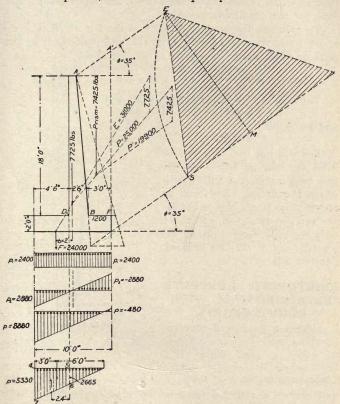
Diagram of Forces for Reinforced Concrete Retaining Wall.
